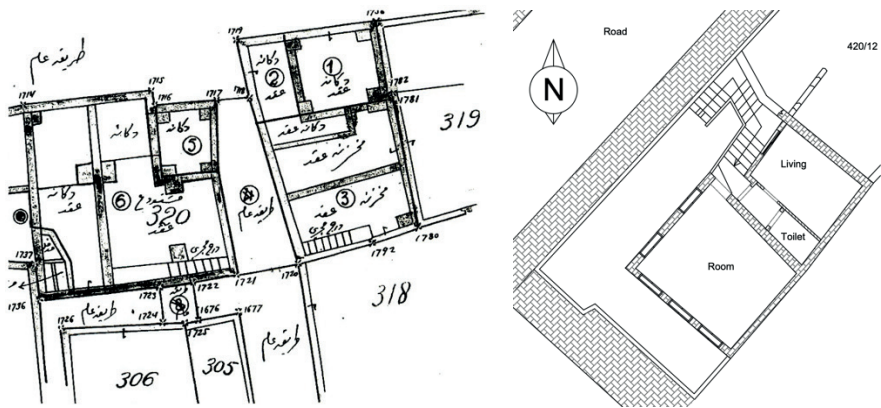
Dr. Yaacoub Labban Habitat, ground and first floor plan (Source: Authors, 2023).
